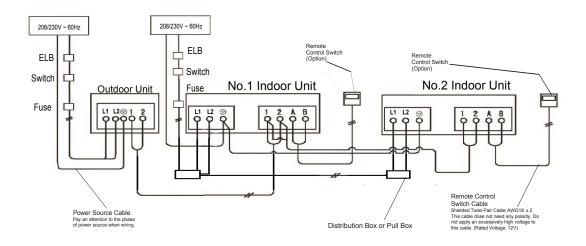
Wiring Connection for Indoor & Outdoor
